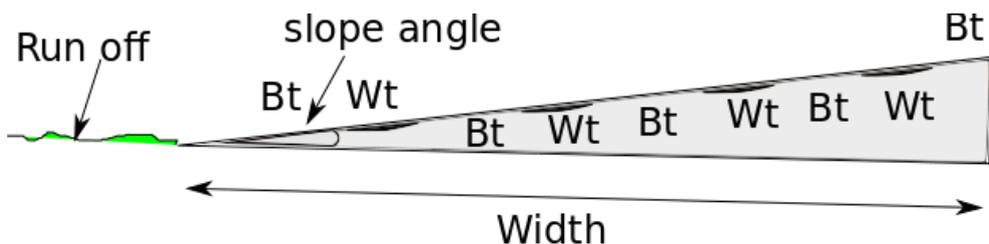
The road is divided into wheel tracks and between tracks and a run-off zone.
